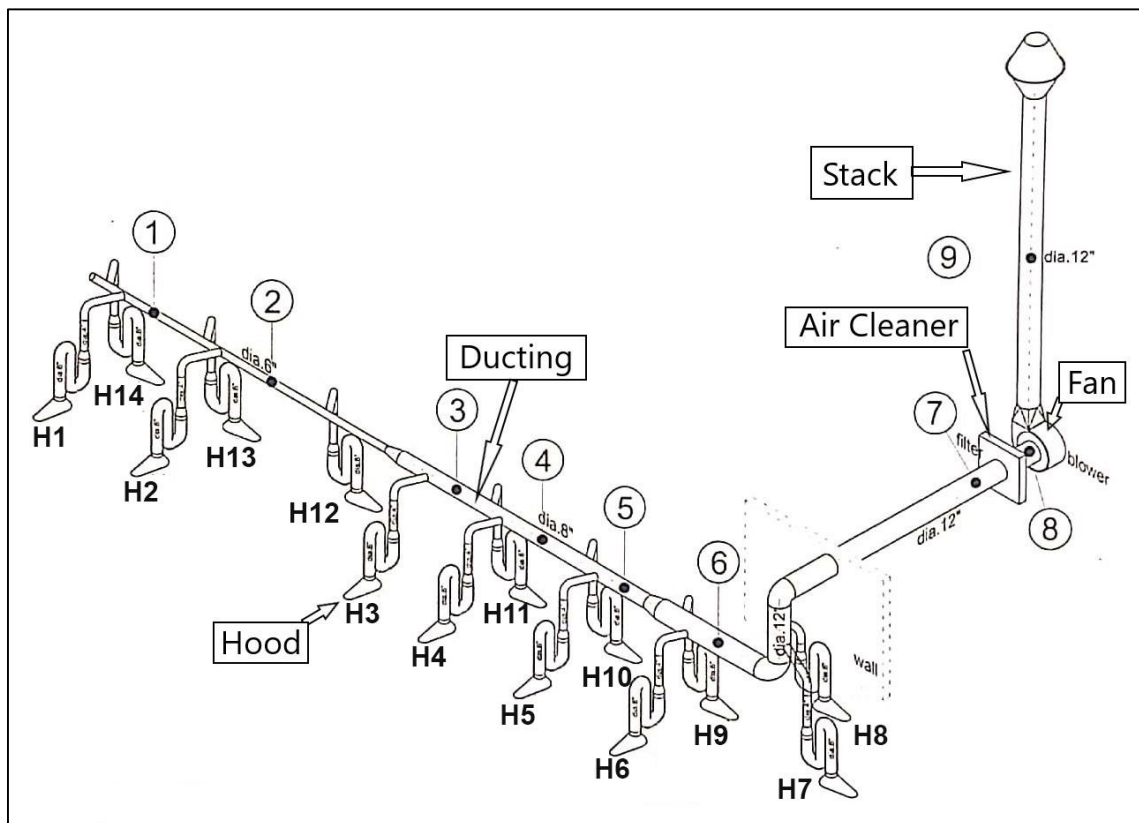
LEV system in welding laboratory, FKMP, UTHM
